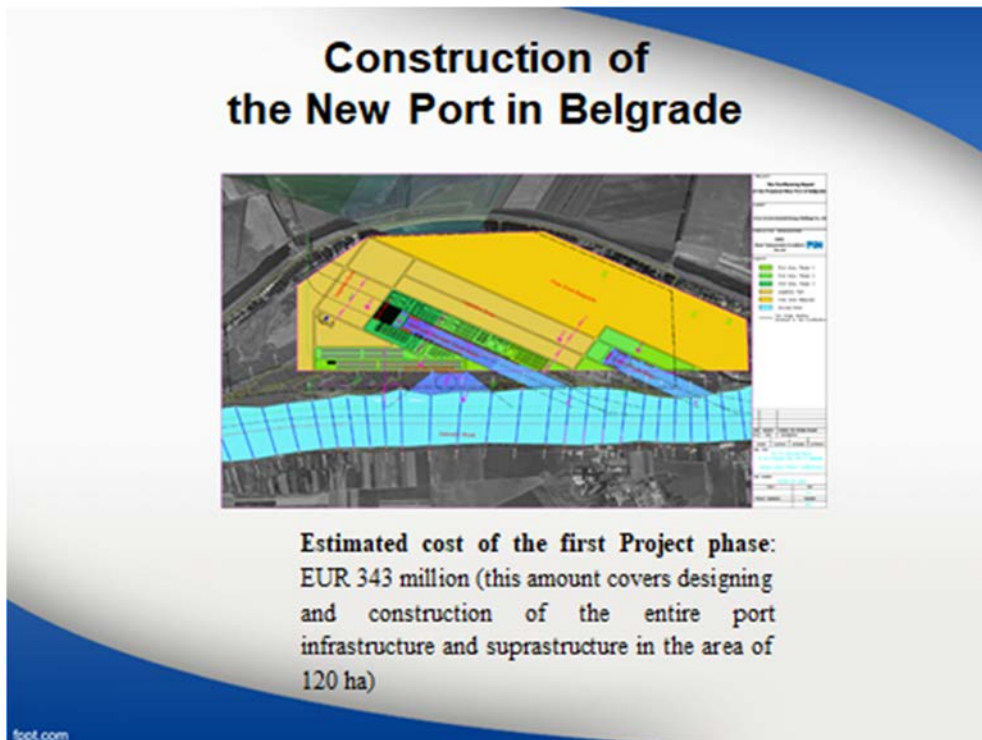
Plan for the construction of the new port in Belgrade (Source: Bozic, 2017).
